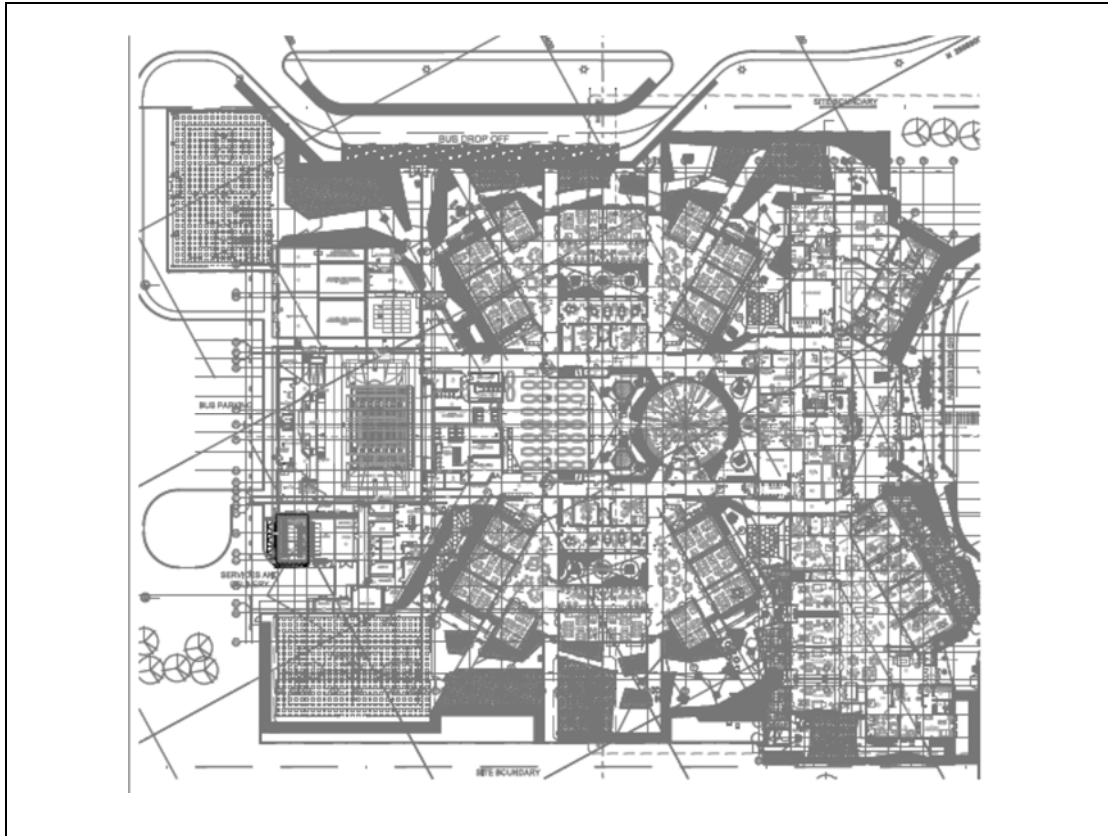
Ground Floor Plan Thumbnail of Building-5
